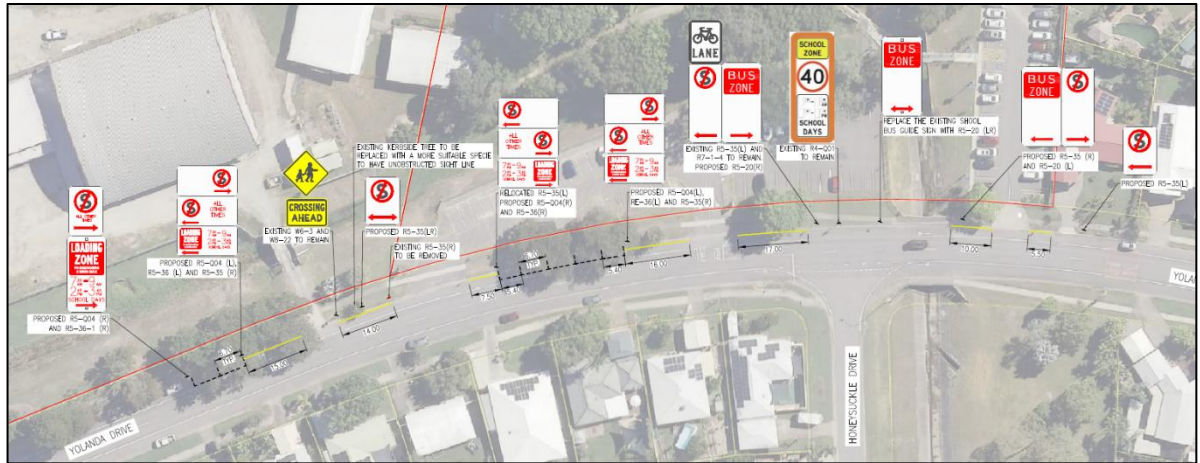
Proposed signage and linemarking plan – Yolanda Drive
